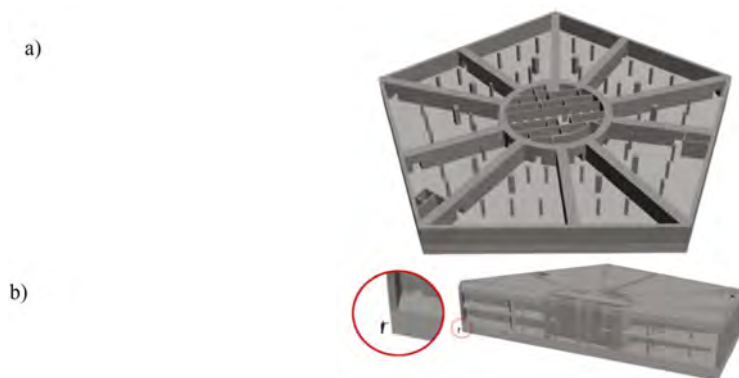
The box foundation and core of tower (a); the model of the box foundation and human scale (b).
